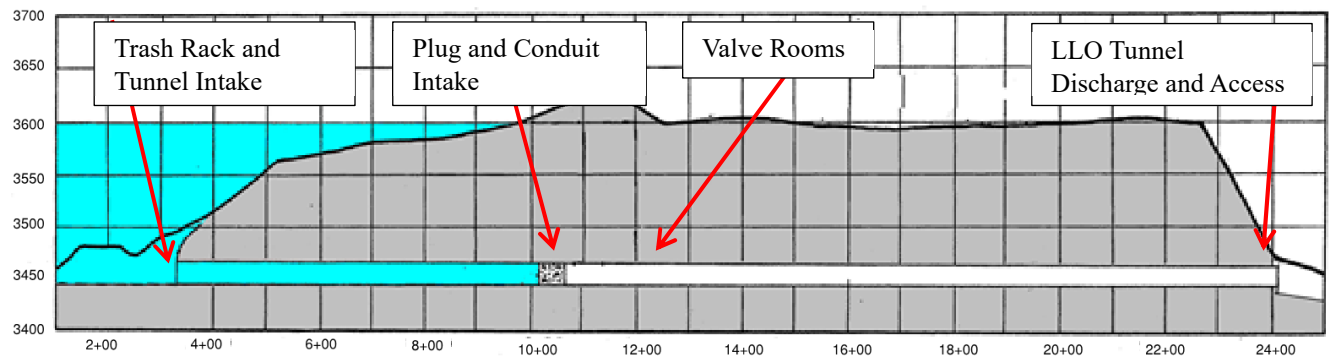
Elevation of LLO Tunnel (drawing dimensioned in ft)
